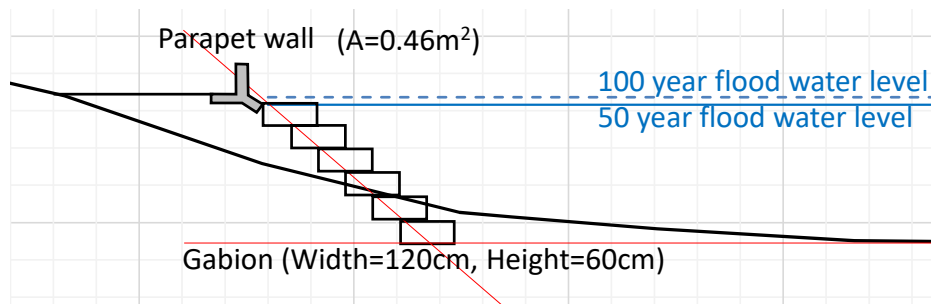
Gabions and Parapet Wall, Transversal Section
